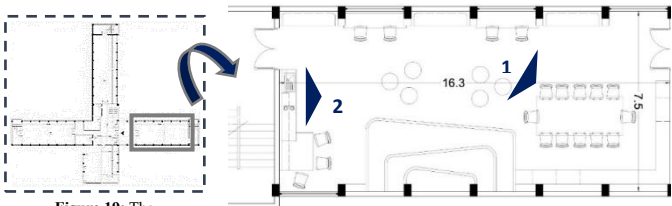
The suggested zone for the common room in the new Ground floor design of Building (B).
